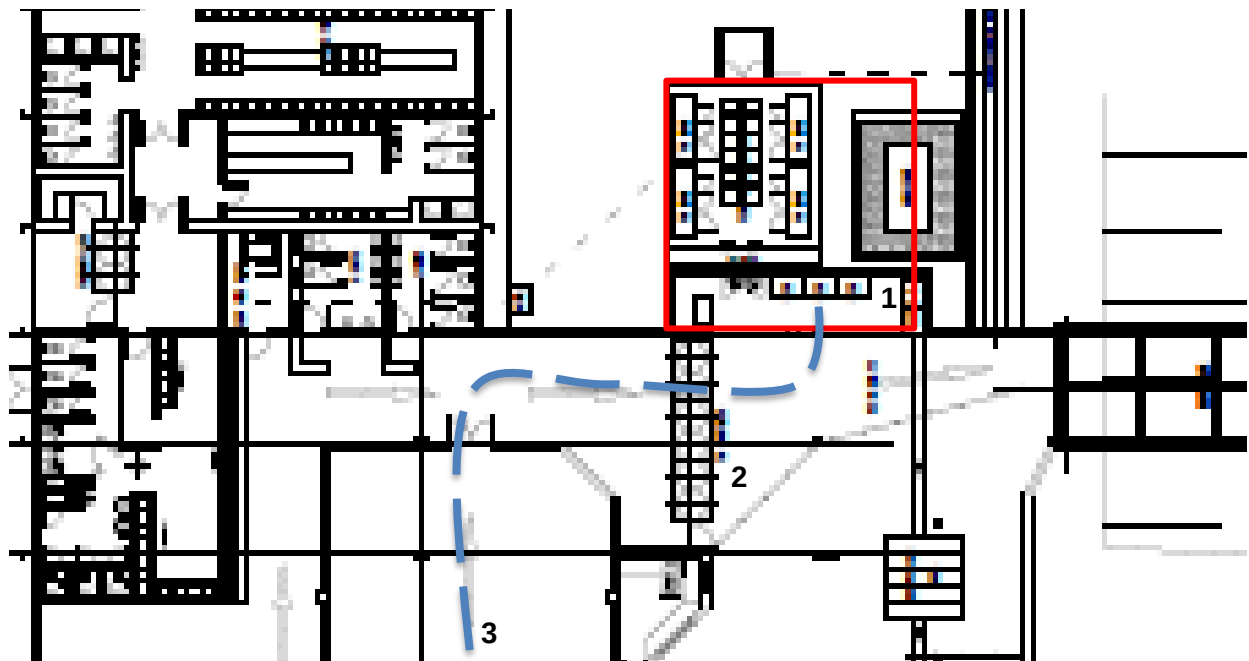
Shaft access layout indicating meal collection bay. Courtesy of Gold Fields
